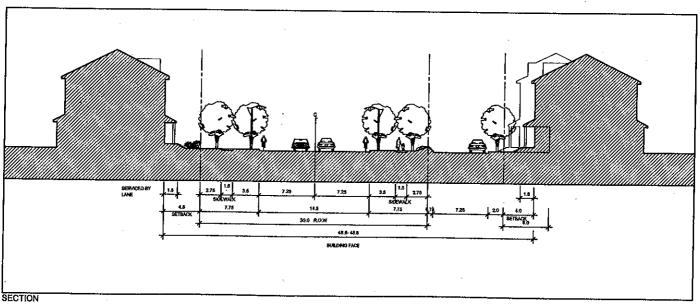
CRESCENT STREET (AT LESLIE STREET)
